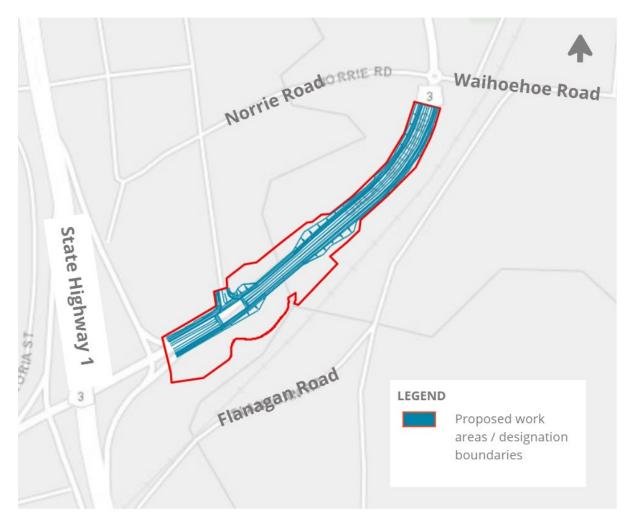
Extent of NoR 2 - Great South Road Upgrade (Drury section)
